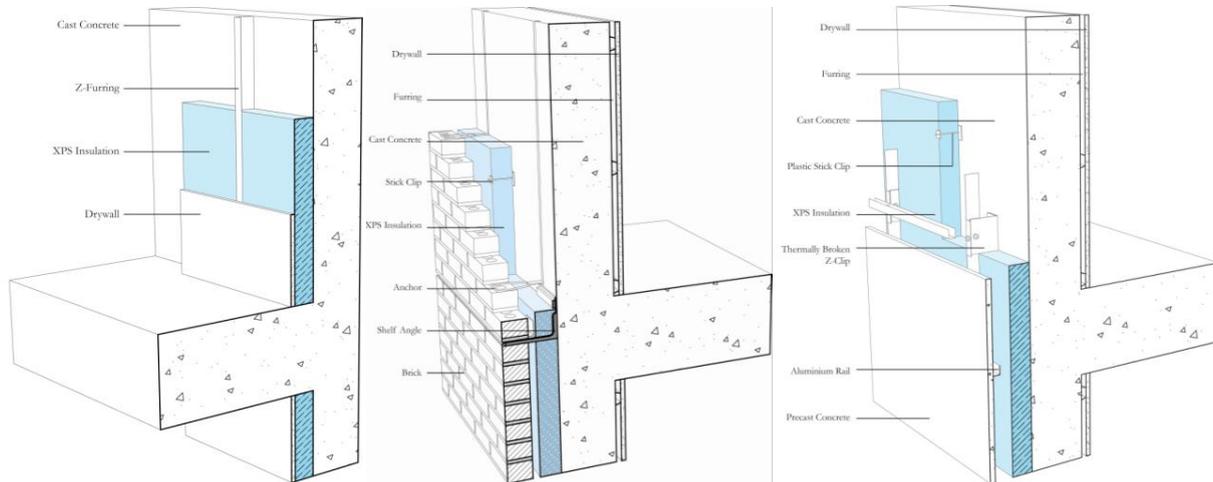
Axonometric of the Connection Details for the Cast-in-Place Concrete Wall with Interior Insulation, Exterior Insulation with a Masonry Façade, and Exterior Insulation with a Thermally Broken Rain Screen
